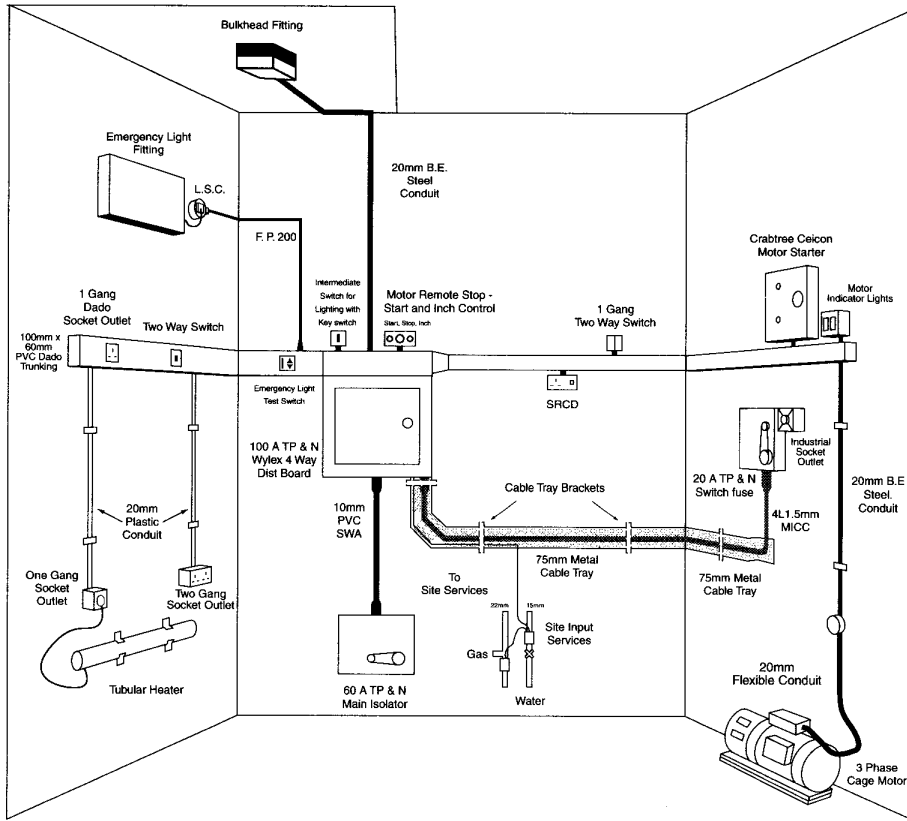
TEST UNIT SHOWING COMPLETED COMPOSITE INSTALLATION
